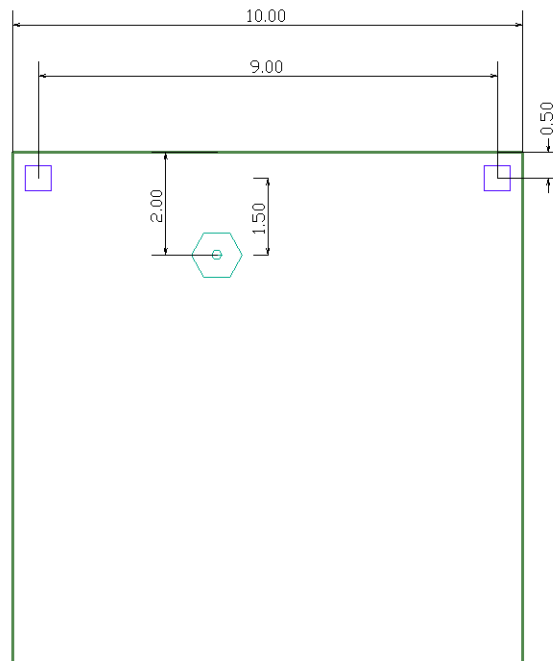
PLAN OF SLAB SUPPORTED ON TWO COLUMNS AND SUBJECT TO AN ECCENTRIC CONCENTRATED LOAD 100 kN
